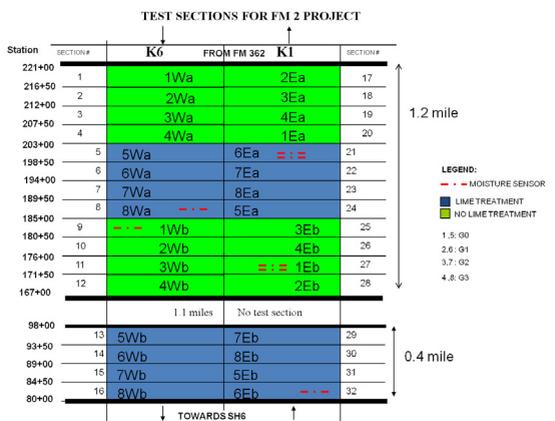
Schematic layout of test sections at FM 2 site (Gupta *et al.* 2008)
